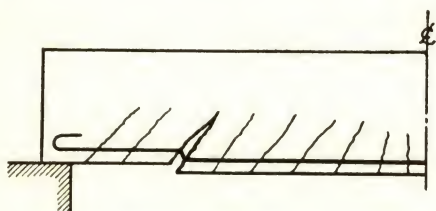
Failure of Beam Reinforced Only with Horizontal Bars
